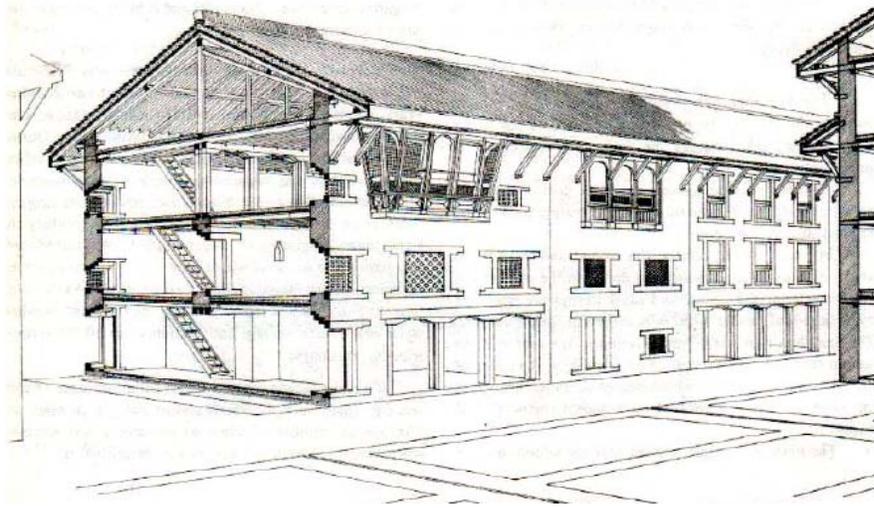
Traditional Building Showing Section (Source: Korn, 1976)
